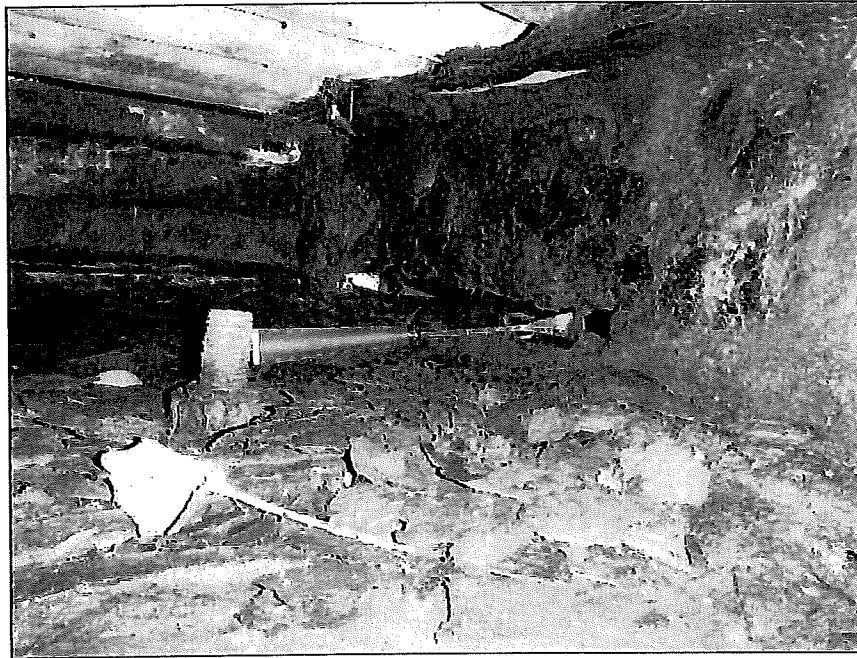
18" L x 3" H area of 100% Section Loss in Web of Beam 6 at East Abutment
